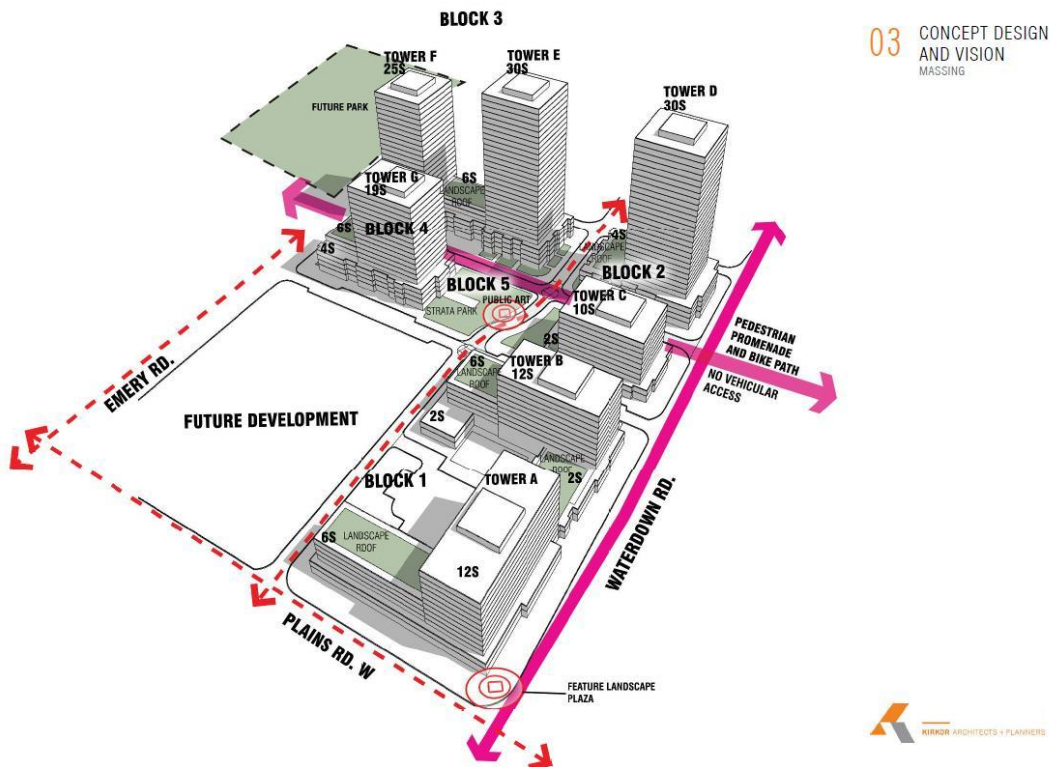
Emshih Conceptual Vision (looking northwest from Plains Road West)
